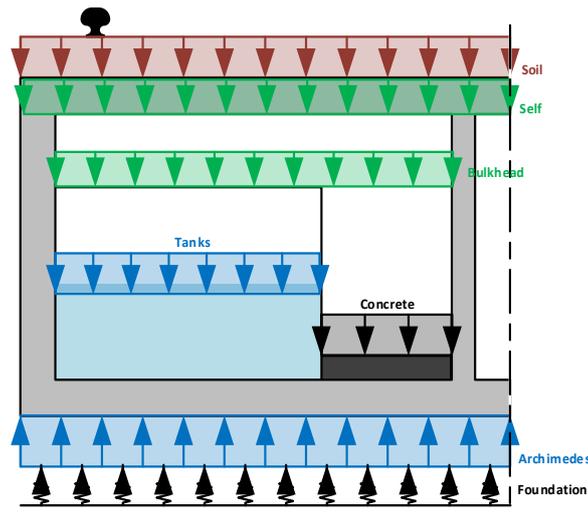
, VERTICAL BALANCE CALCULATION; SITUATION SKETCH LOAD CASE V-III
